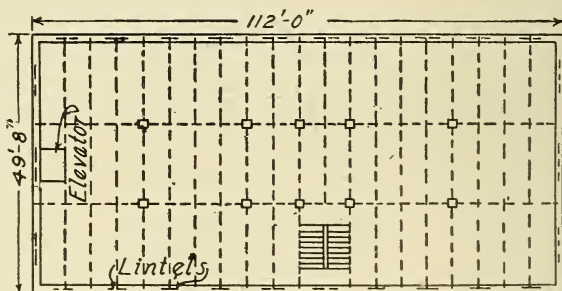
Plan of Shop Building, Swarthmore College, Swarthmore, Pa.
